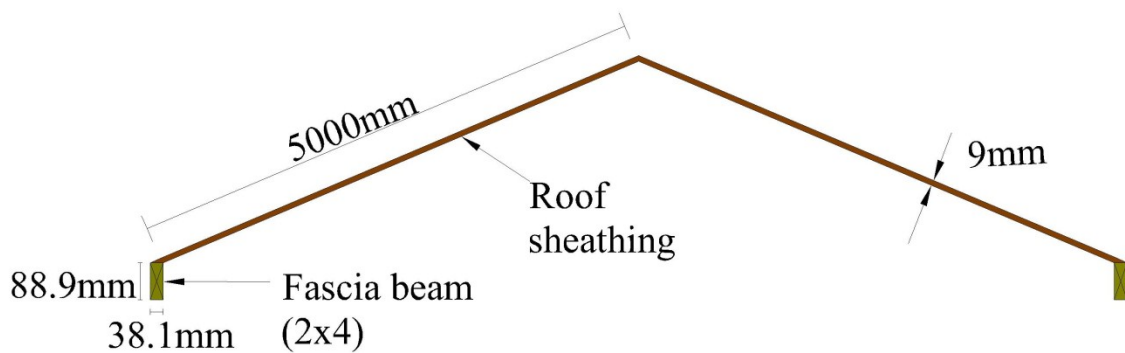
Roof sheathing and fascia beam are considered for roof bending stiffness.
